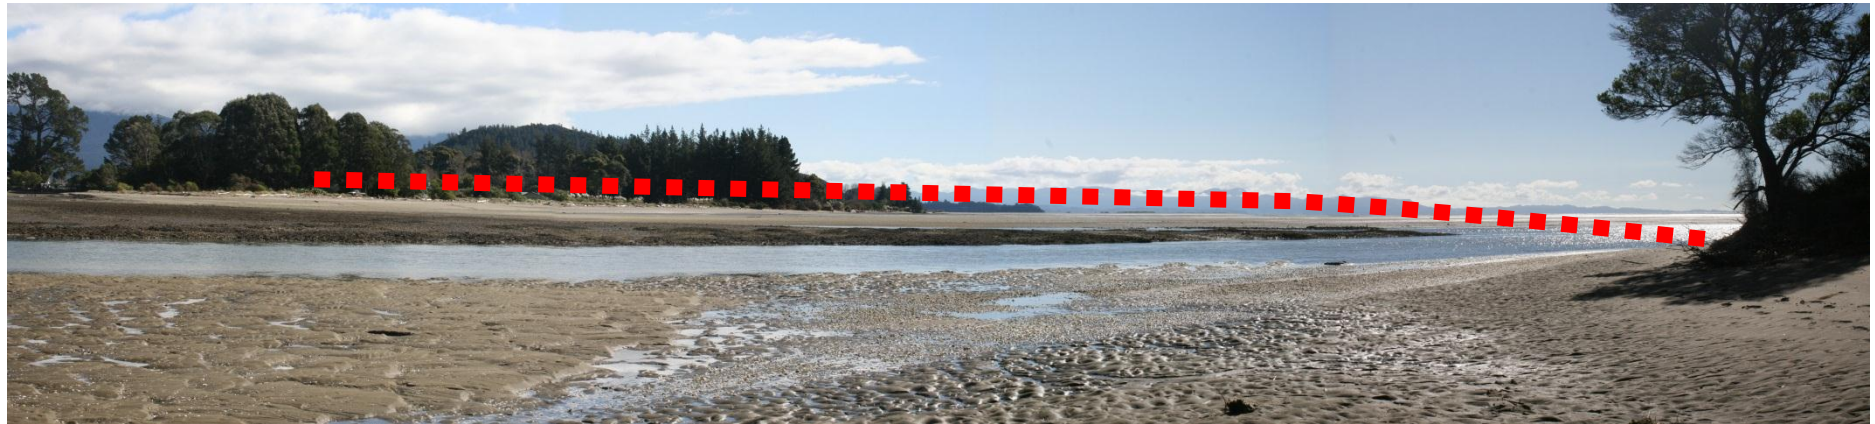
Site of proposed Truss Bridge across from the Motupipi sand spit to Rototai. Red dotted line gives rough approximation of Truss bridge location.
